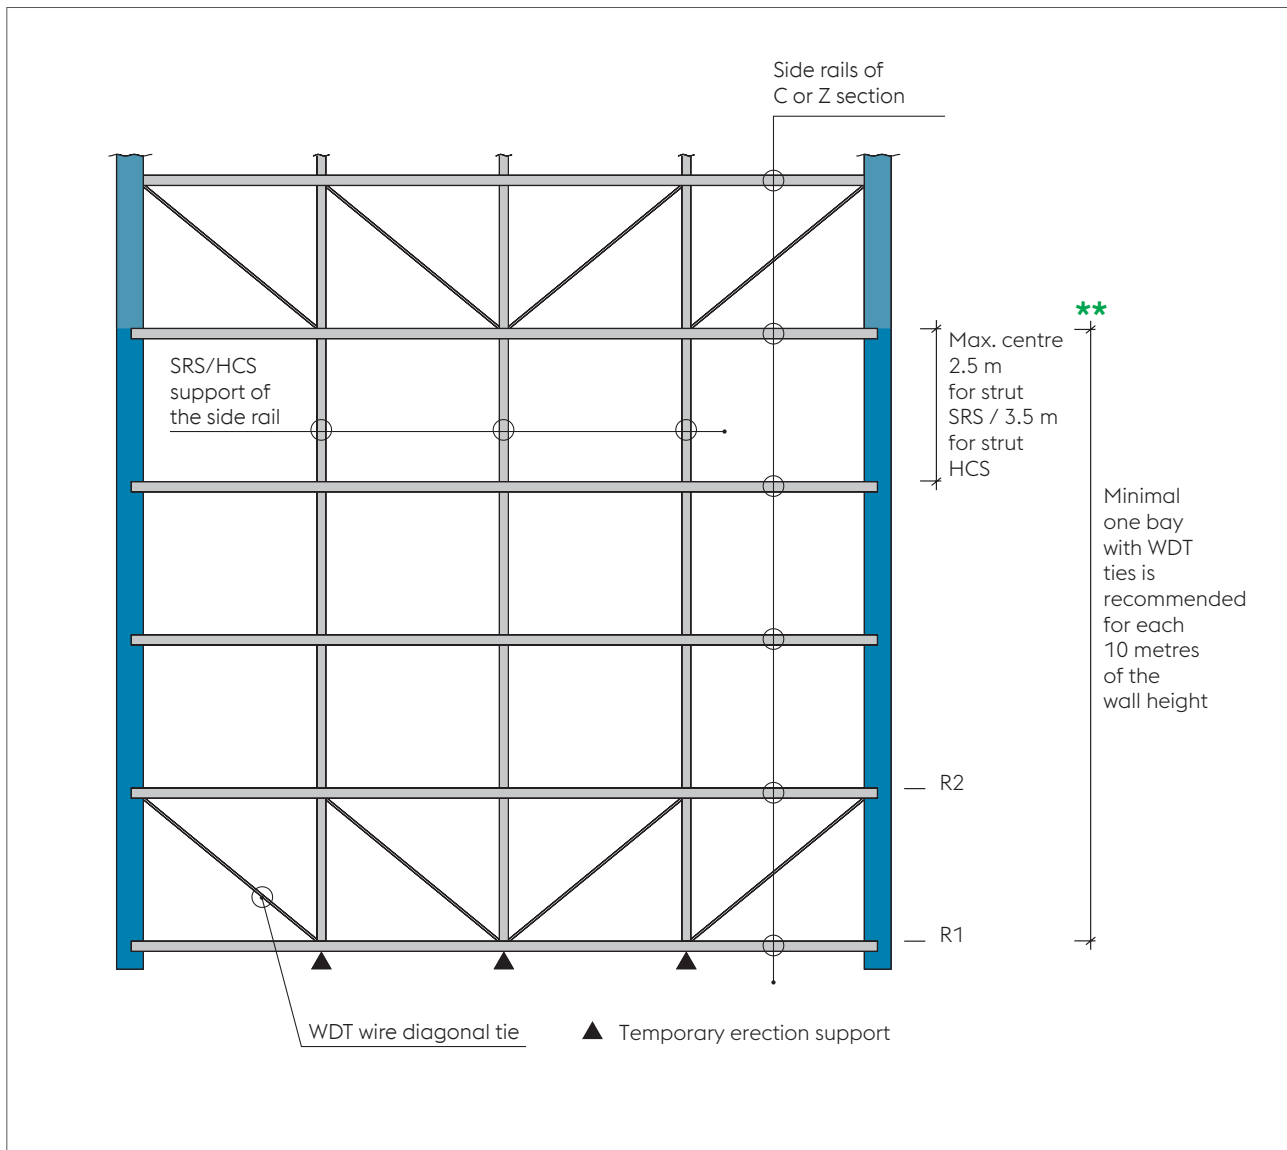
Layout of side rails for spans of 10.10 - 13.00 metres
